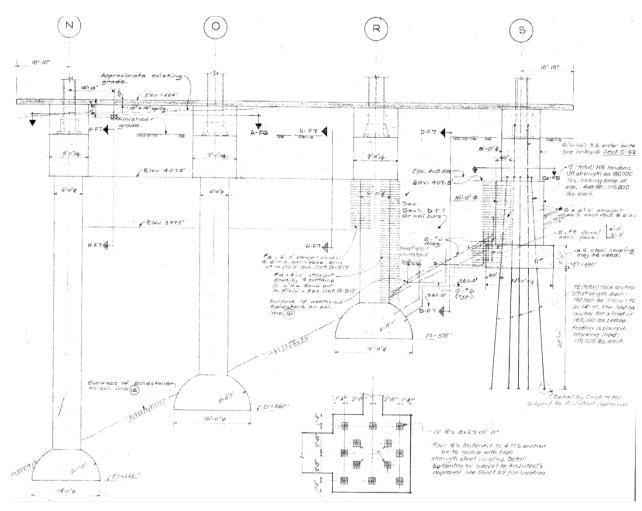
Typical foundation elevation showing belled piers and shallow footing with rock anchors into sandstone bedrock.
